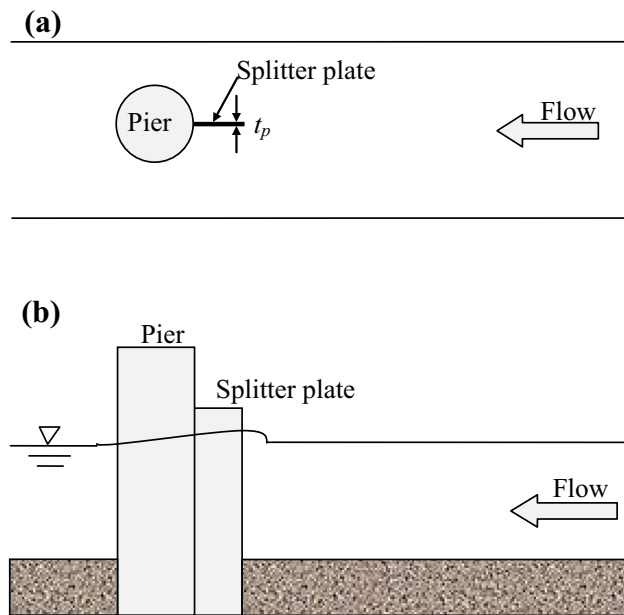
Splitter plate attached to the pier upstream face along the vertical plane of symmetry: a plan view, and b elevation view
